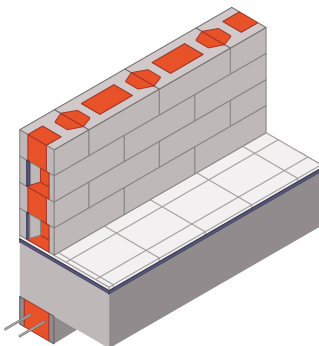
Cross Section Image of reinforced hollow concrete blocks
